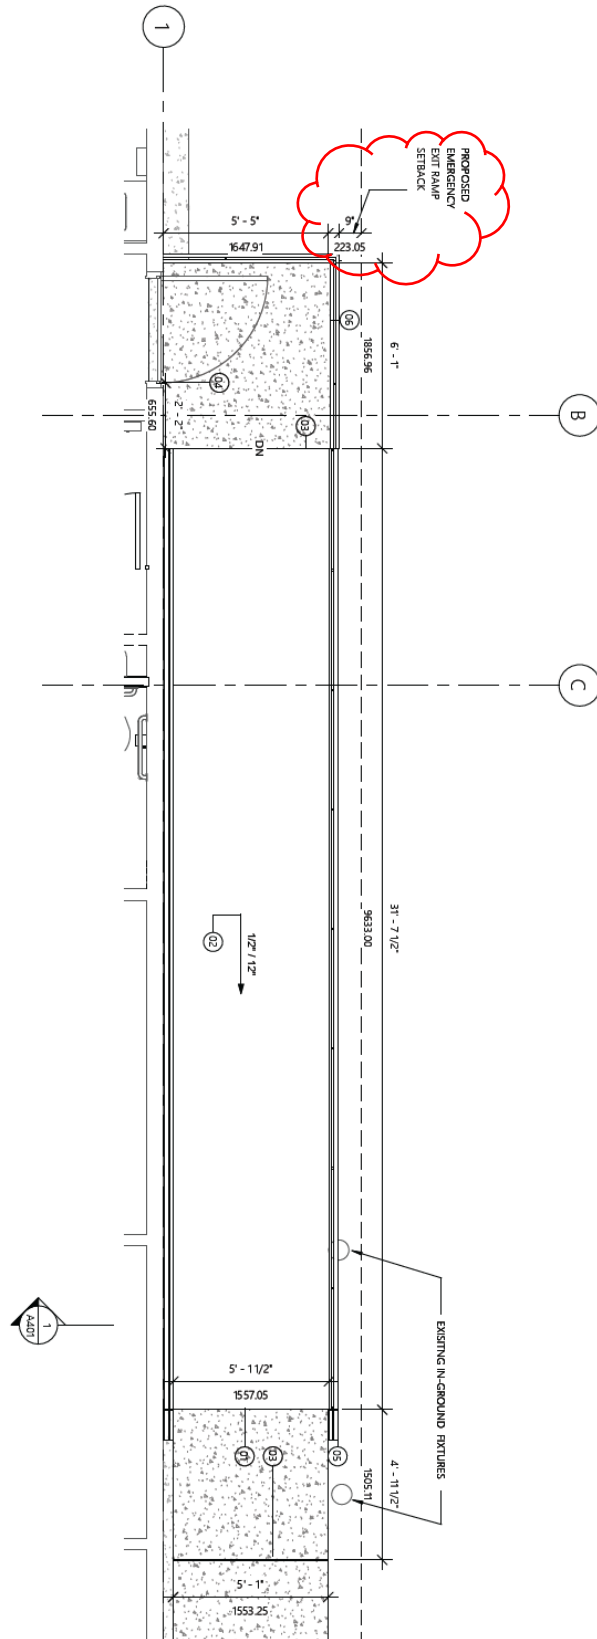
Emergency exit ramp details. The proposed 0.2 metre setback measurement is circled in red.
